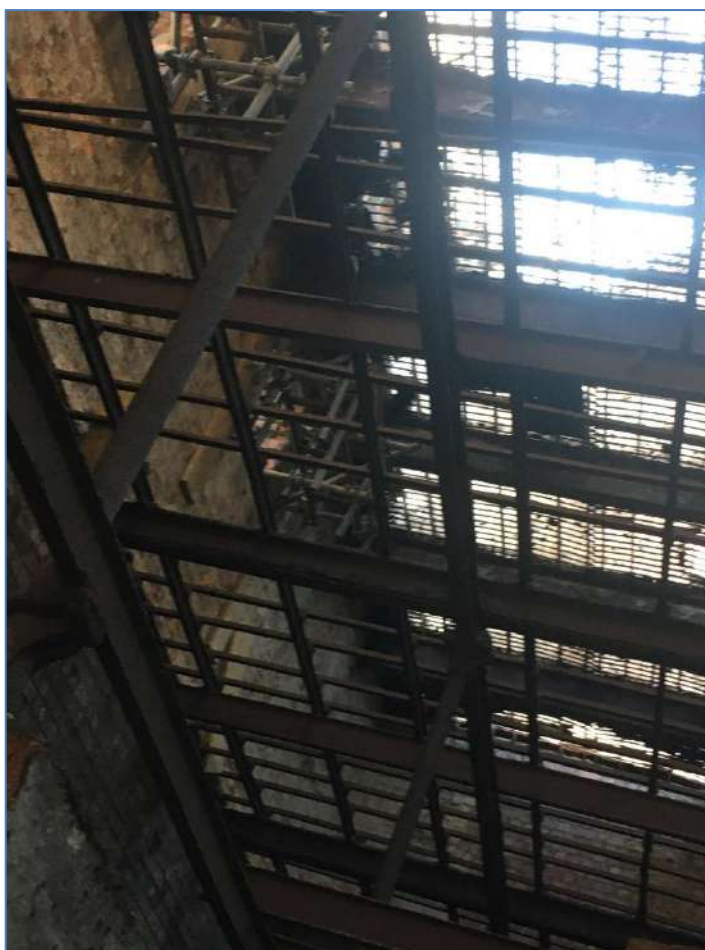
Grid floor detail in east kiln, image taken looking upwards
